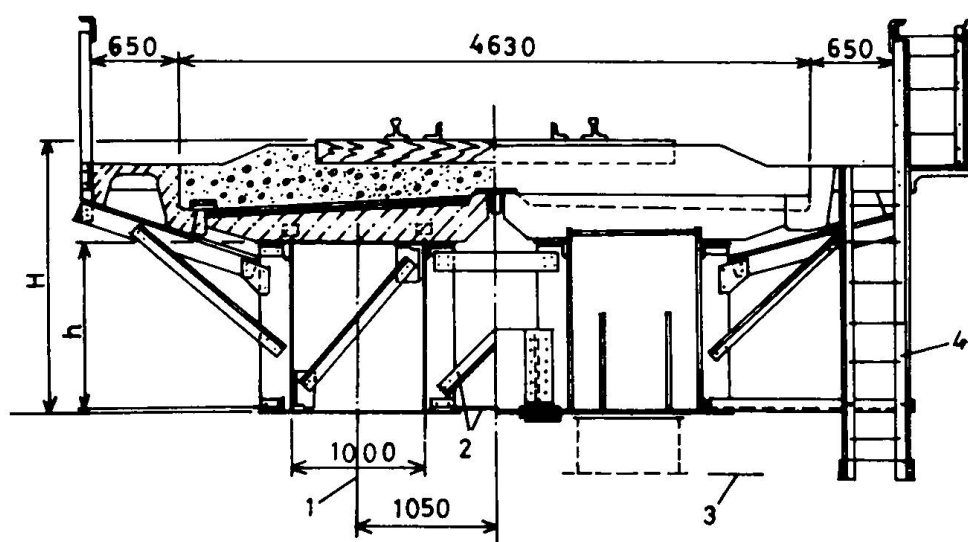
Typical cross section of superstructure comprising two shop fabricated units.
